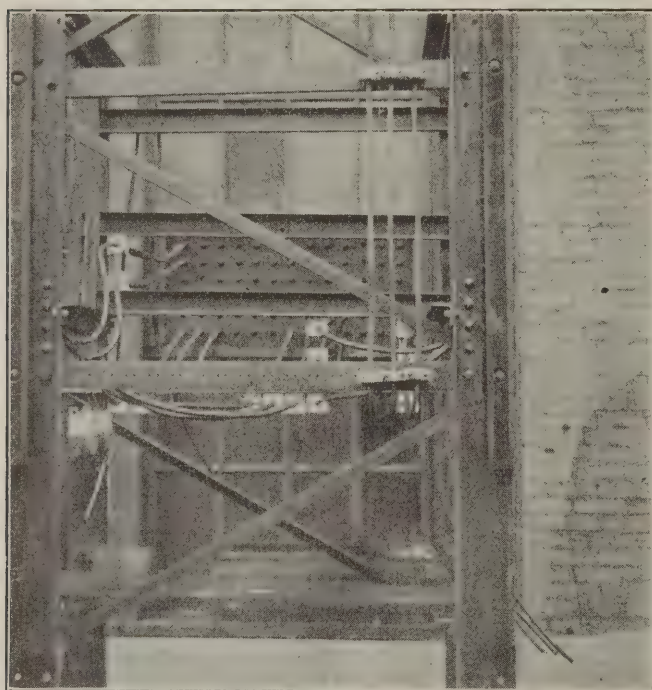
Showing How Feeders Come Through Wall of Power House and Arrangement on Tower
